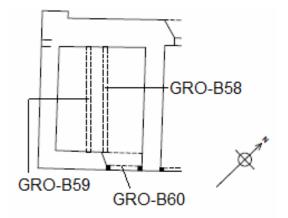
Ground-floor plan of tower 1, showing the location of samples GRO-B58–60 (after Finn et al 2009)
